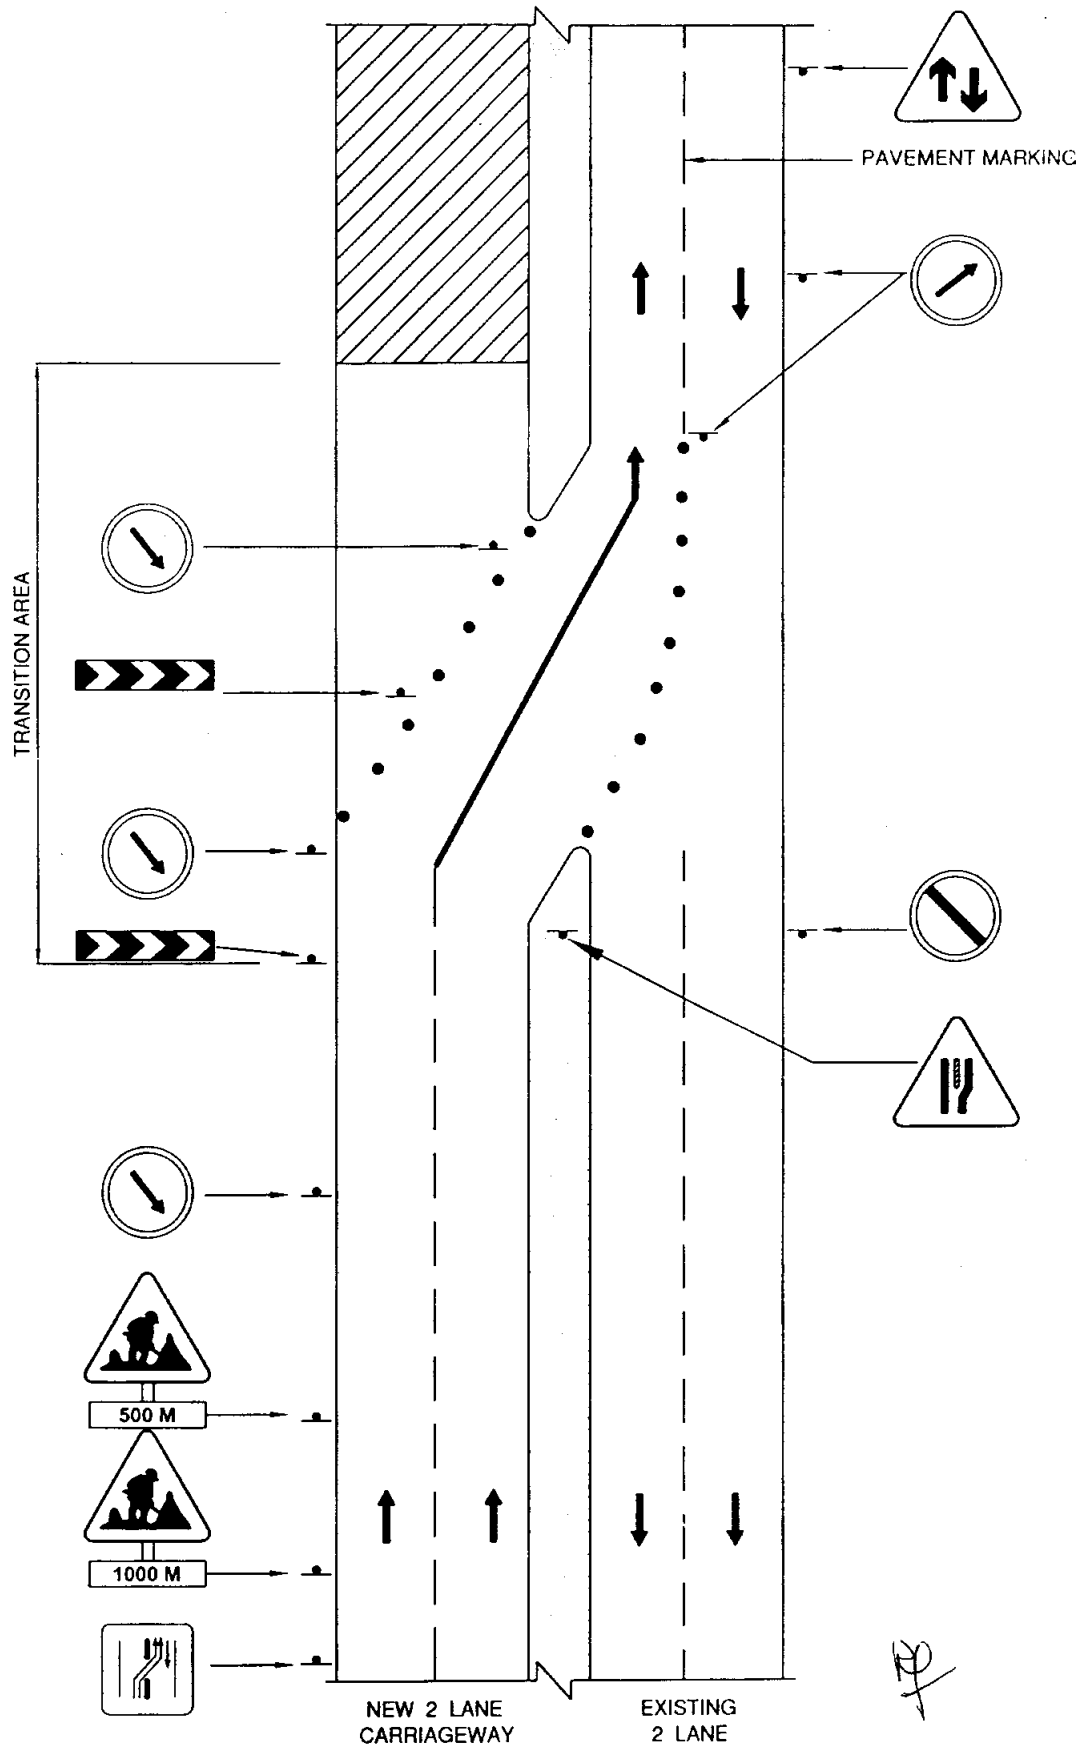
Typical Construction and Crossover Detail in Rural Areas of Highway
